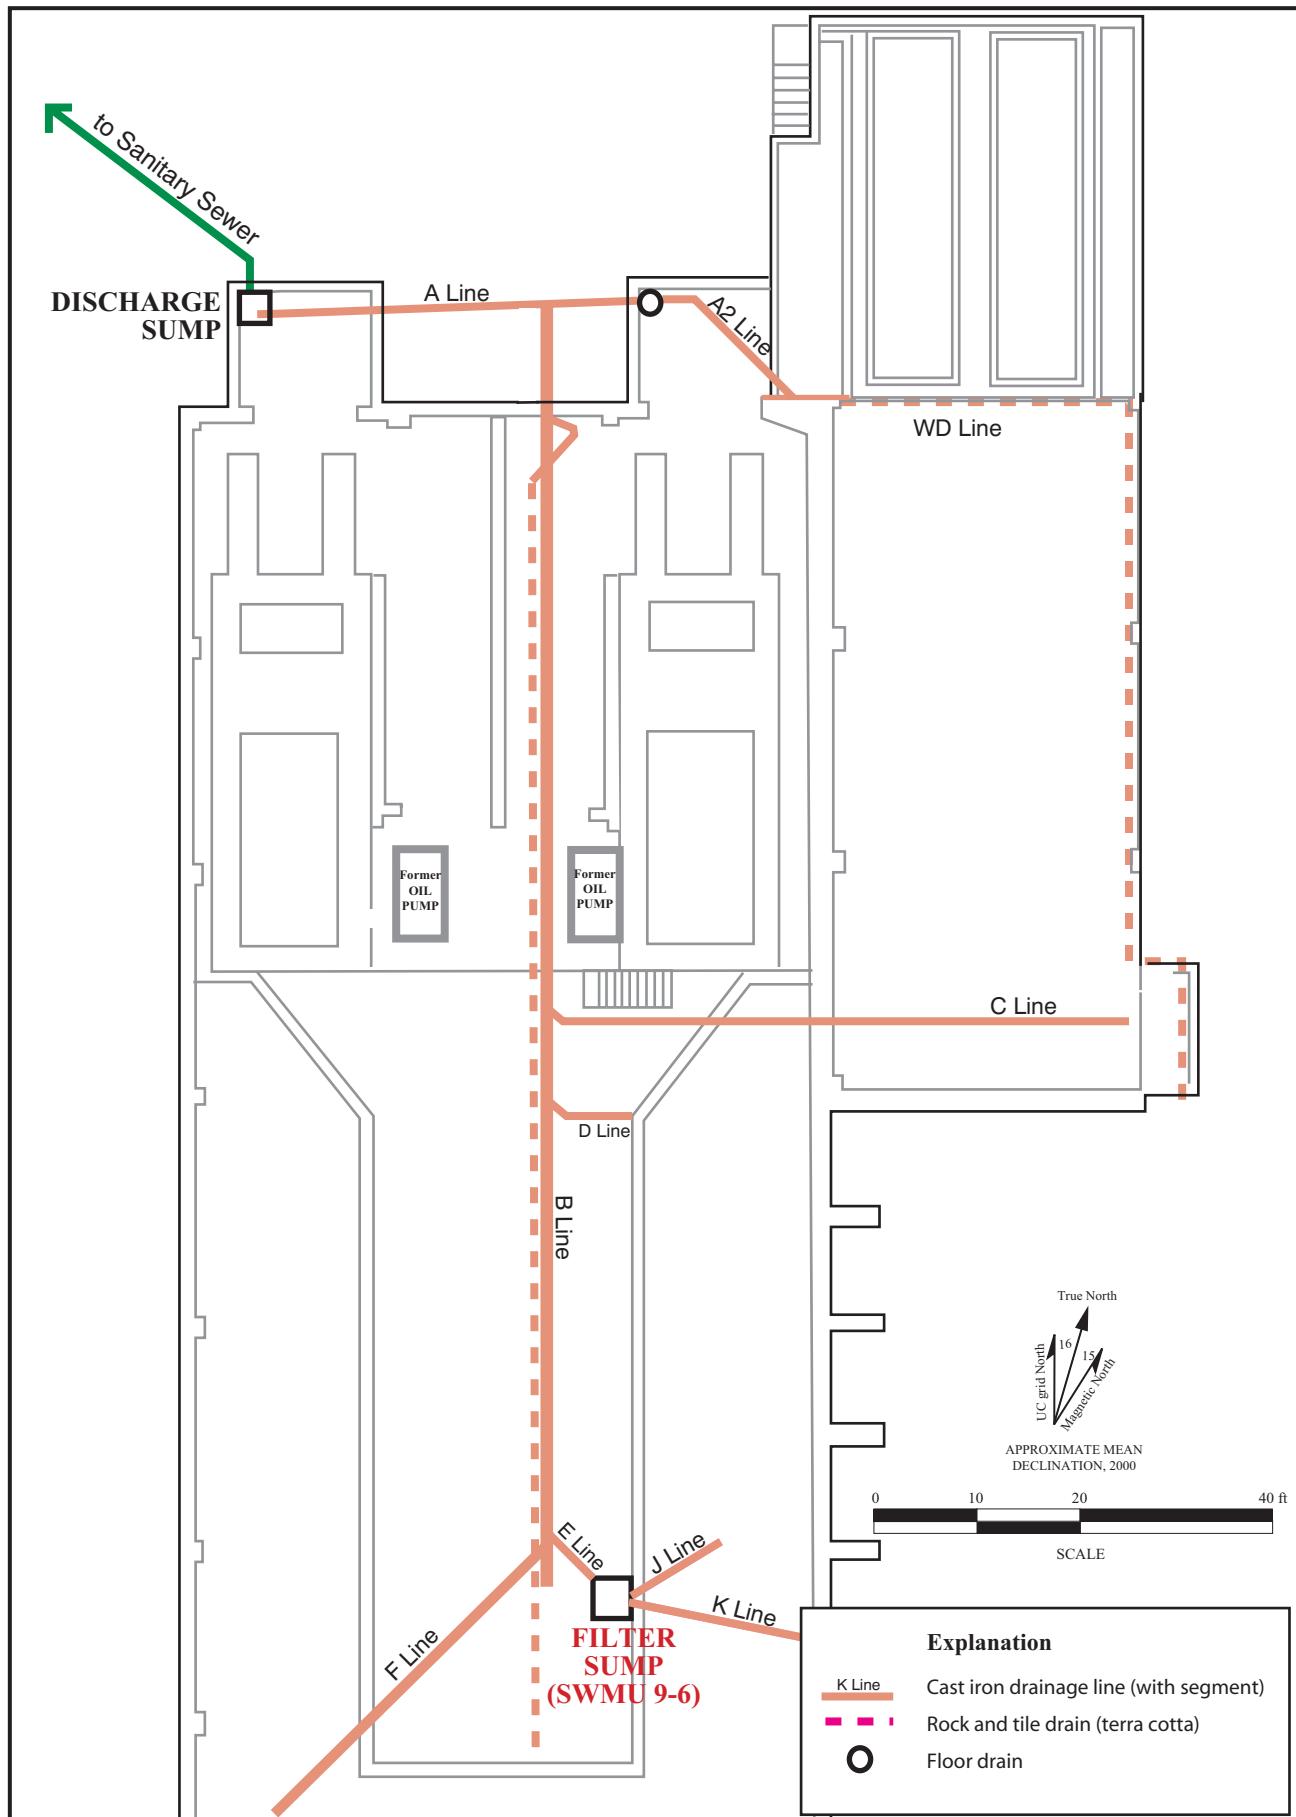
Plan View of Building 51 Motor Generator Room Basement Showing Location of Drainage Lines.
